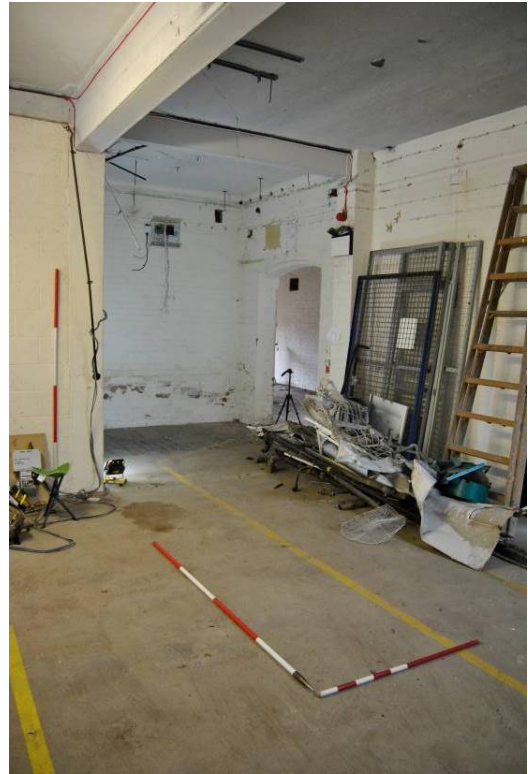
Original floor level at south side of Bays 5/6 looking south-east into [O.G3a] at Bay 4 .
